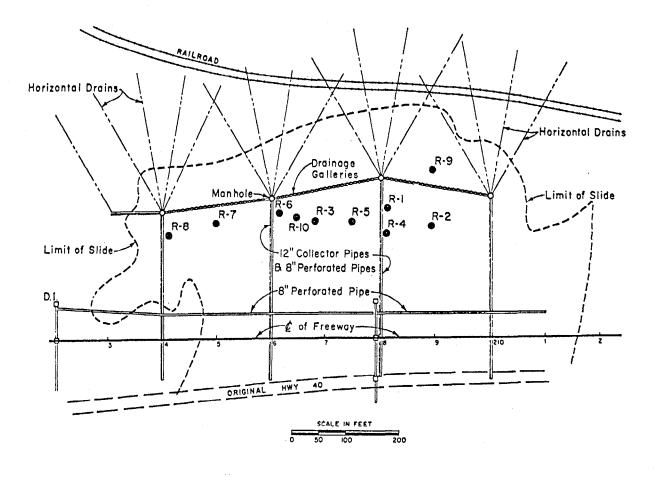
Plan Showing Drainage Details and Boring Locations At Towle Slide (35)
